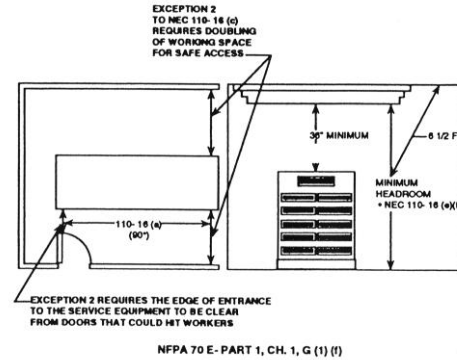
Proper headroom shall be provided for the safety of personnel servicing the electrical equipment.
